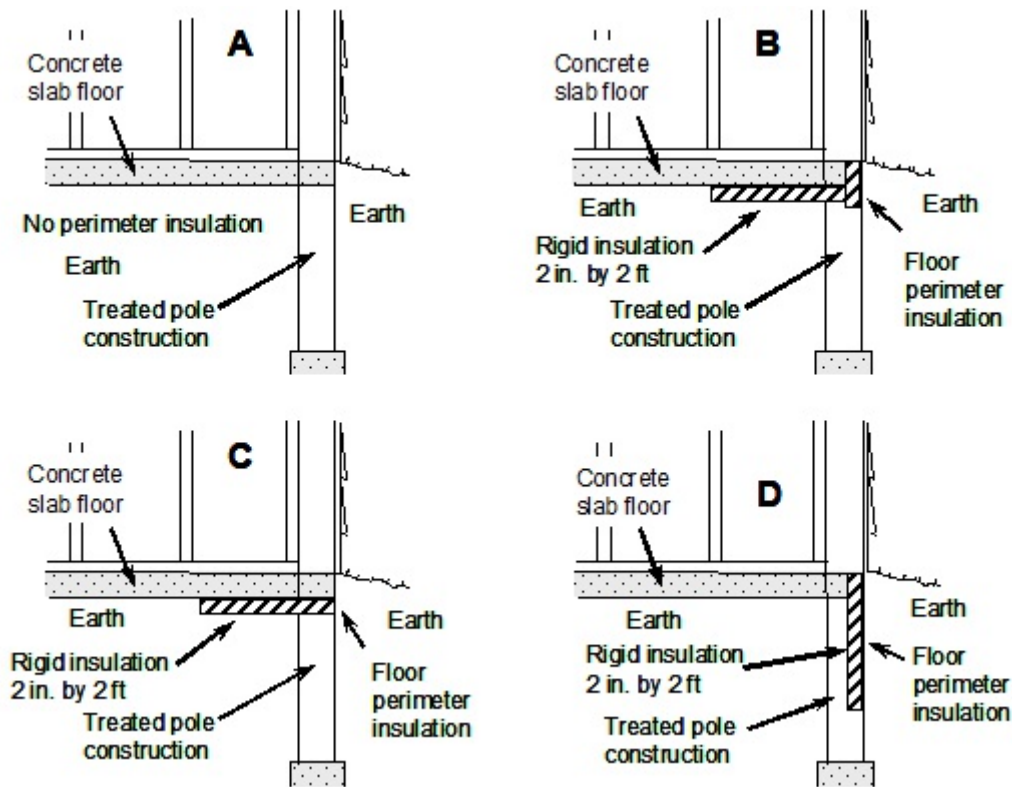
Methods of installing rigid floor perimeter insulation for a building of treated pole construction where the concrete floor is not weight bearing. Refer to Table 385.10 for estimated heat loss for each wall installation technique.
